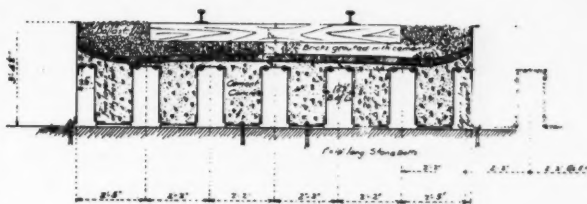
TROUGH FLOOR SYSTEM ON THE P. R. R.
